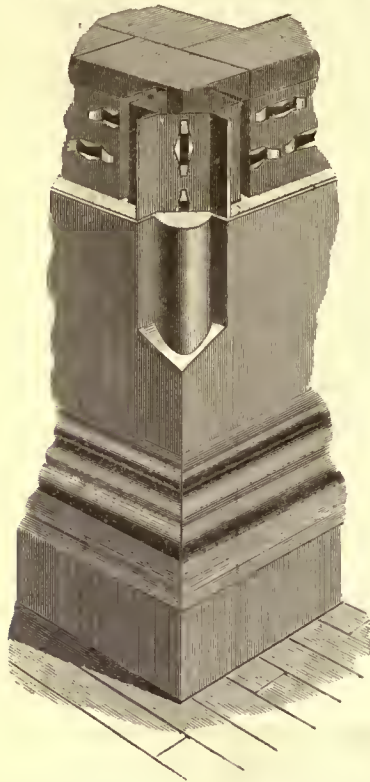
Perspective showing external angle of brick wall with lathing, furring, screeding, stopped off angle bead, and cement base.
